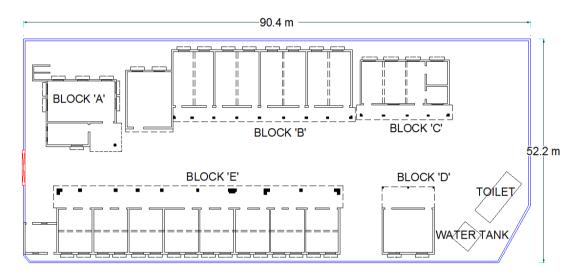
Layout of the school building at Ranipokhri, Uttarakhand.
